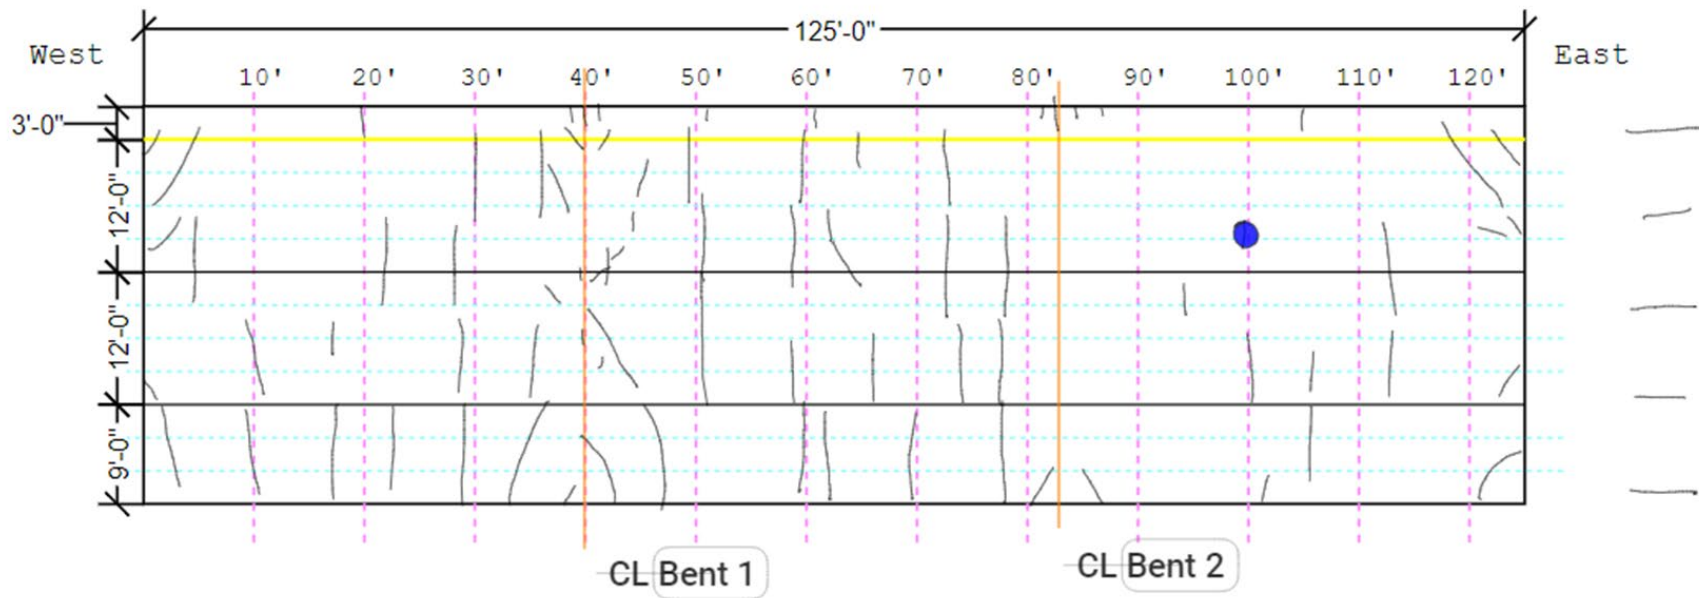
Field notes for Bridge 1392, 2022 inspection, soffit.
